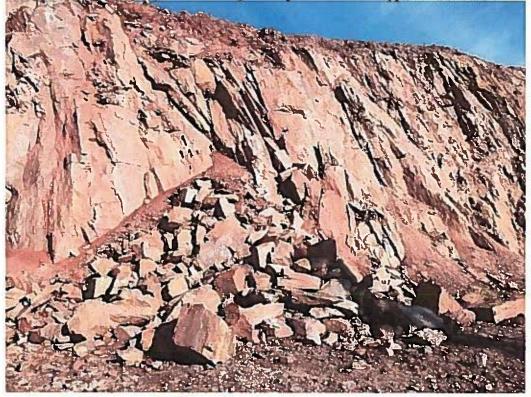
10m high internal wall on 650 Bench. Geologic structure and blast damage contribute to local instability.
